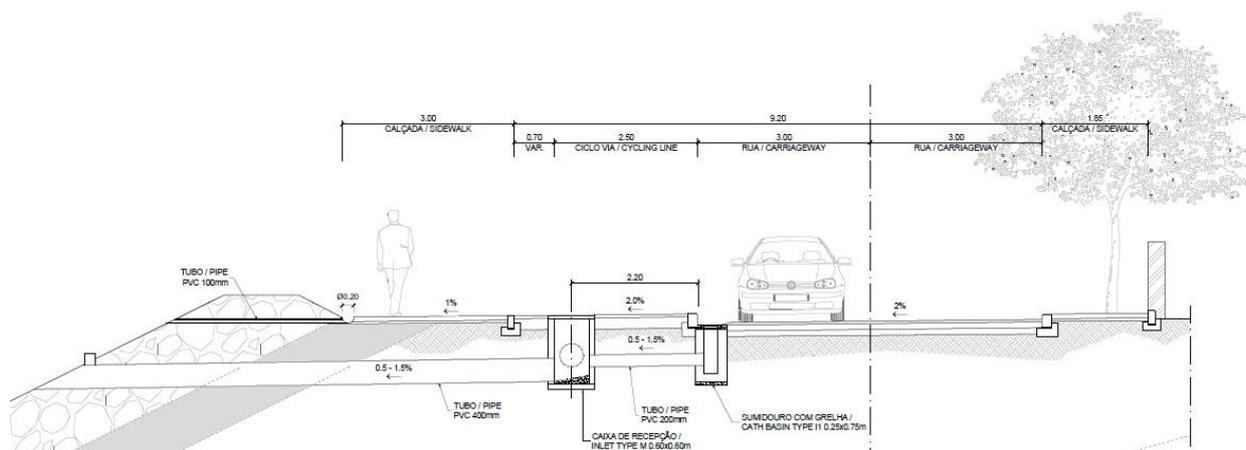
Typical section Lagarto Bay (0+000 – 1+880 and 2+420 – 2+760).
